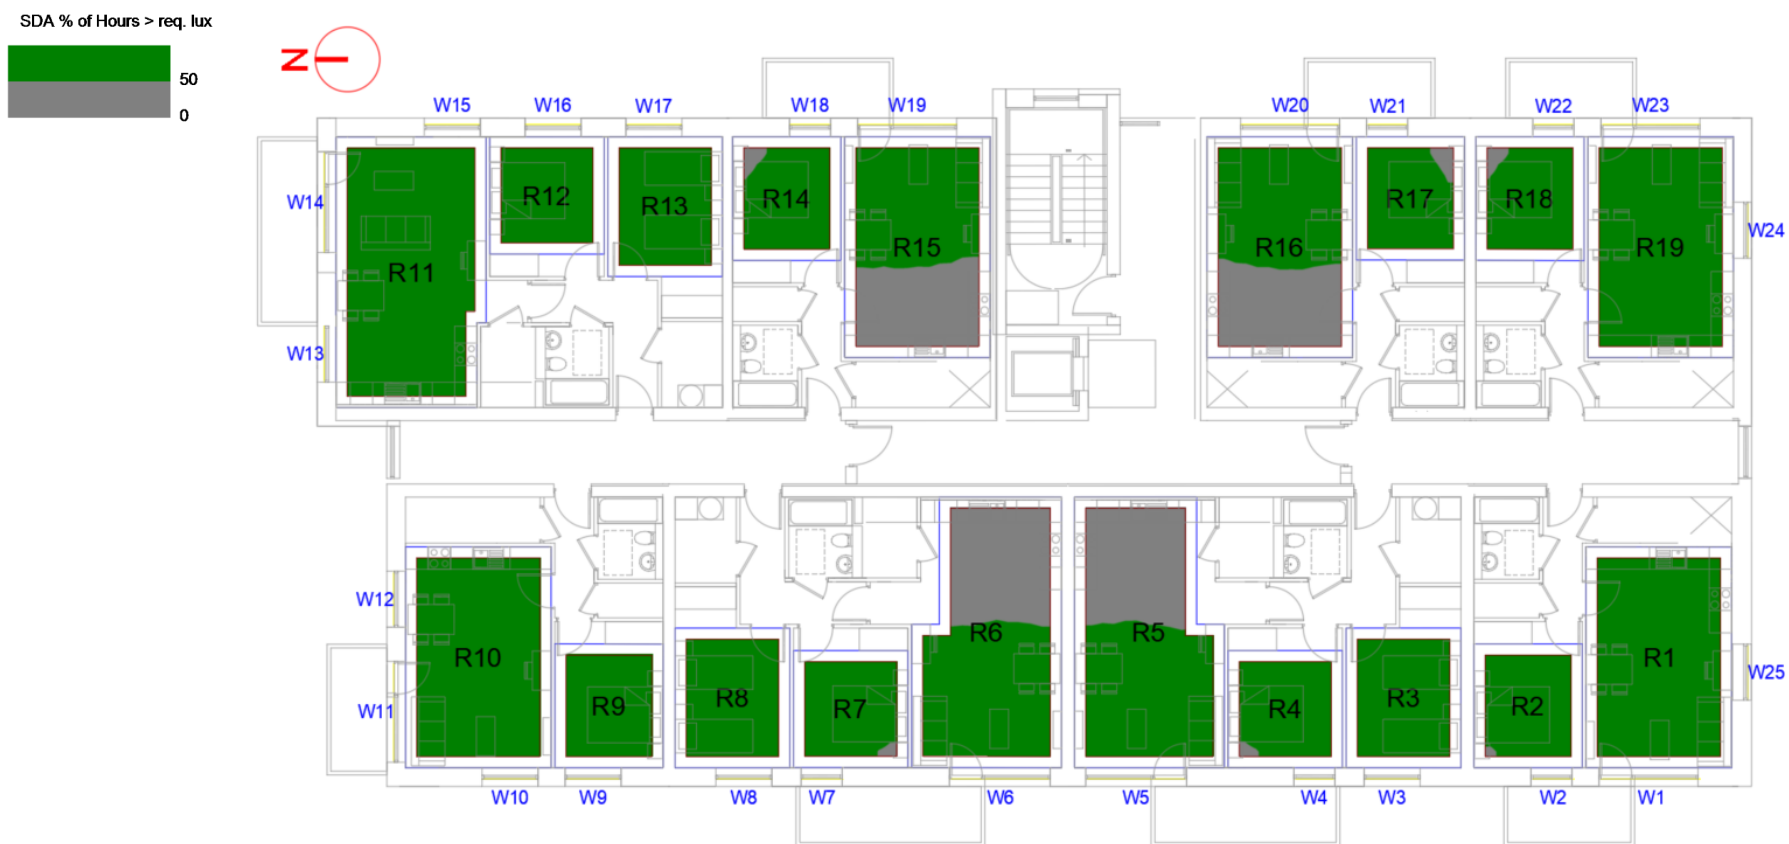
Proposed First Floor sDA Contours of Apartment Block A
